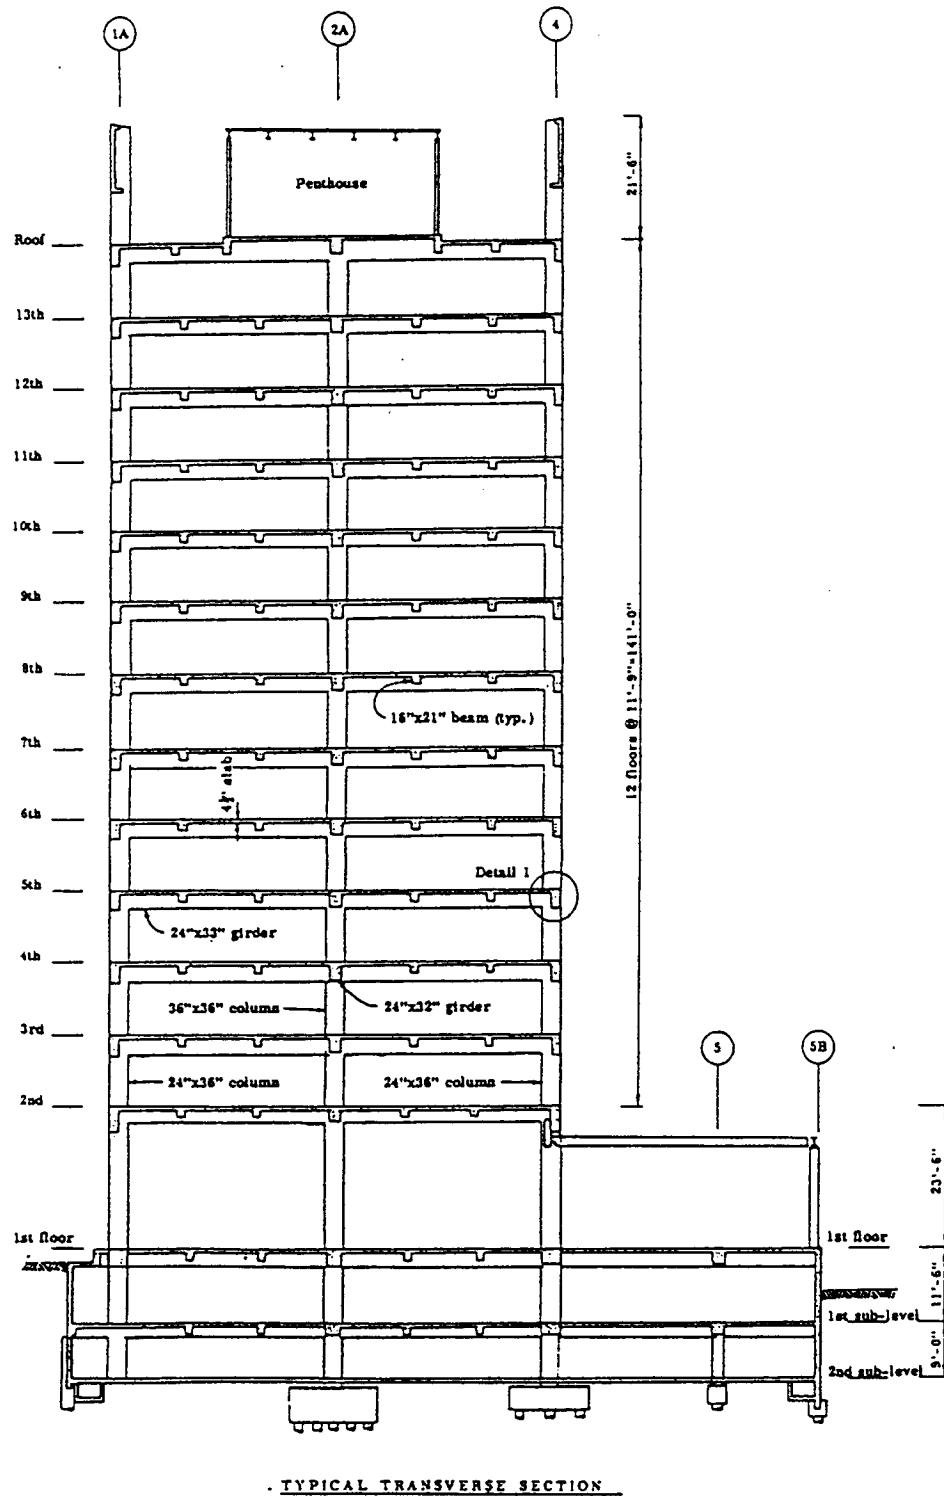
Typical Elevation, 15 Story RC Building
